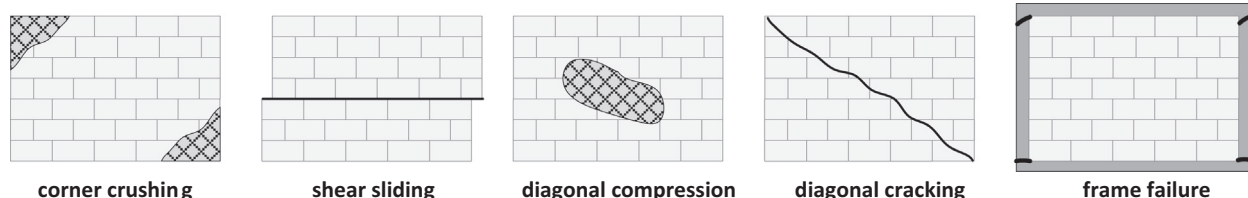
Typical failure modes of masonry infilled frames subjected to lateral loading.
